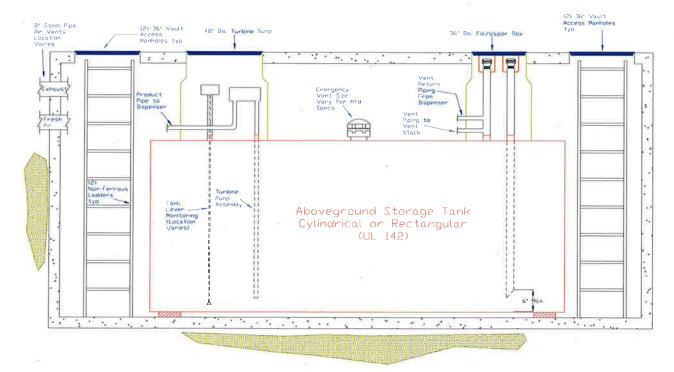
Front Sectional Views of Typical Vaulted AST
